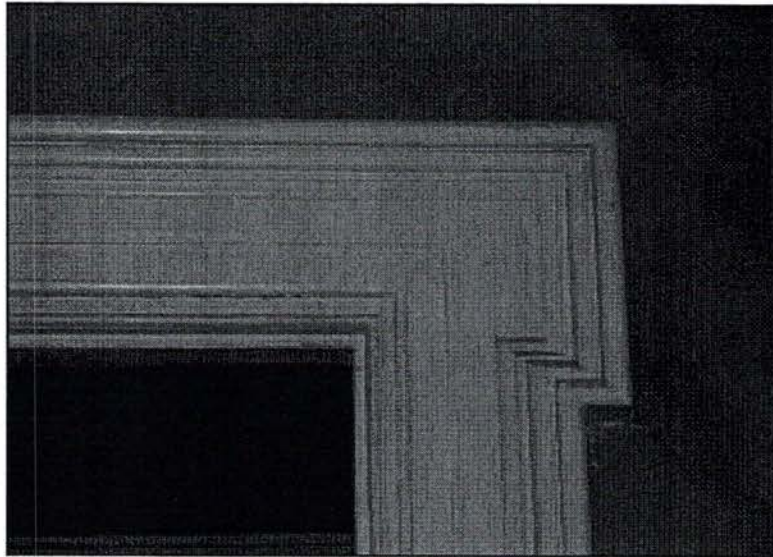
The door and window frames of Rooms 102 and 103 have “ears” at their tops.
